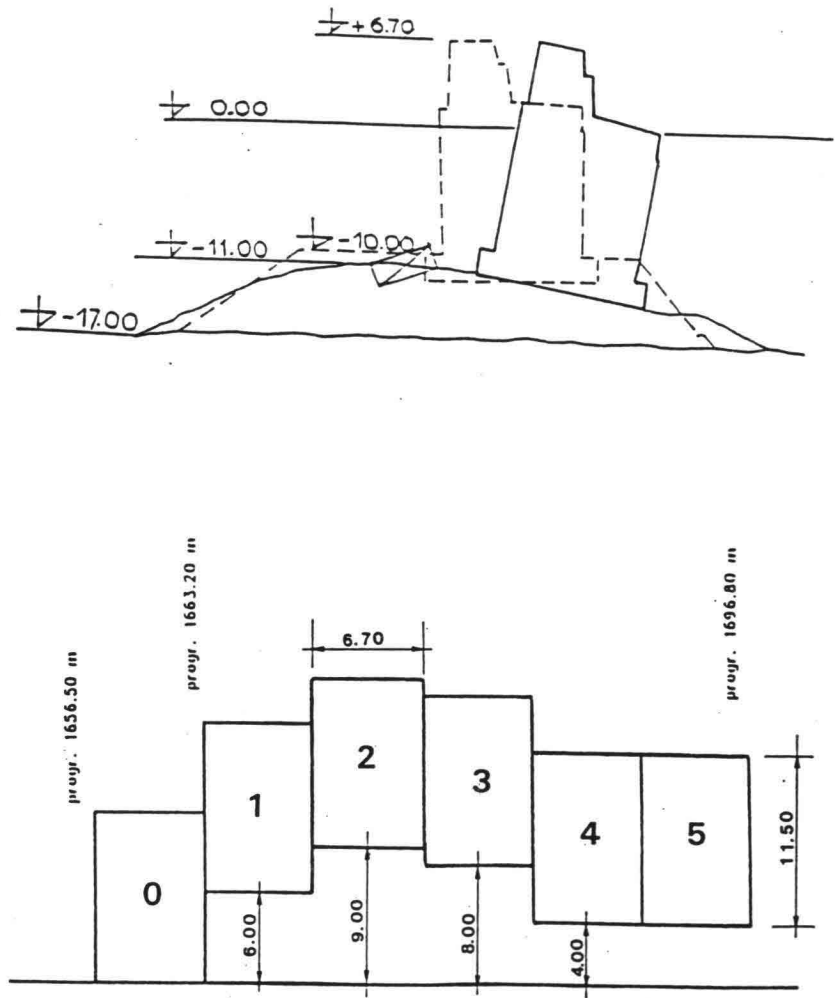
Plan and section of the type D caisson displaced during the storm of Jan. 1987 Naples harbour
